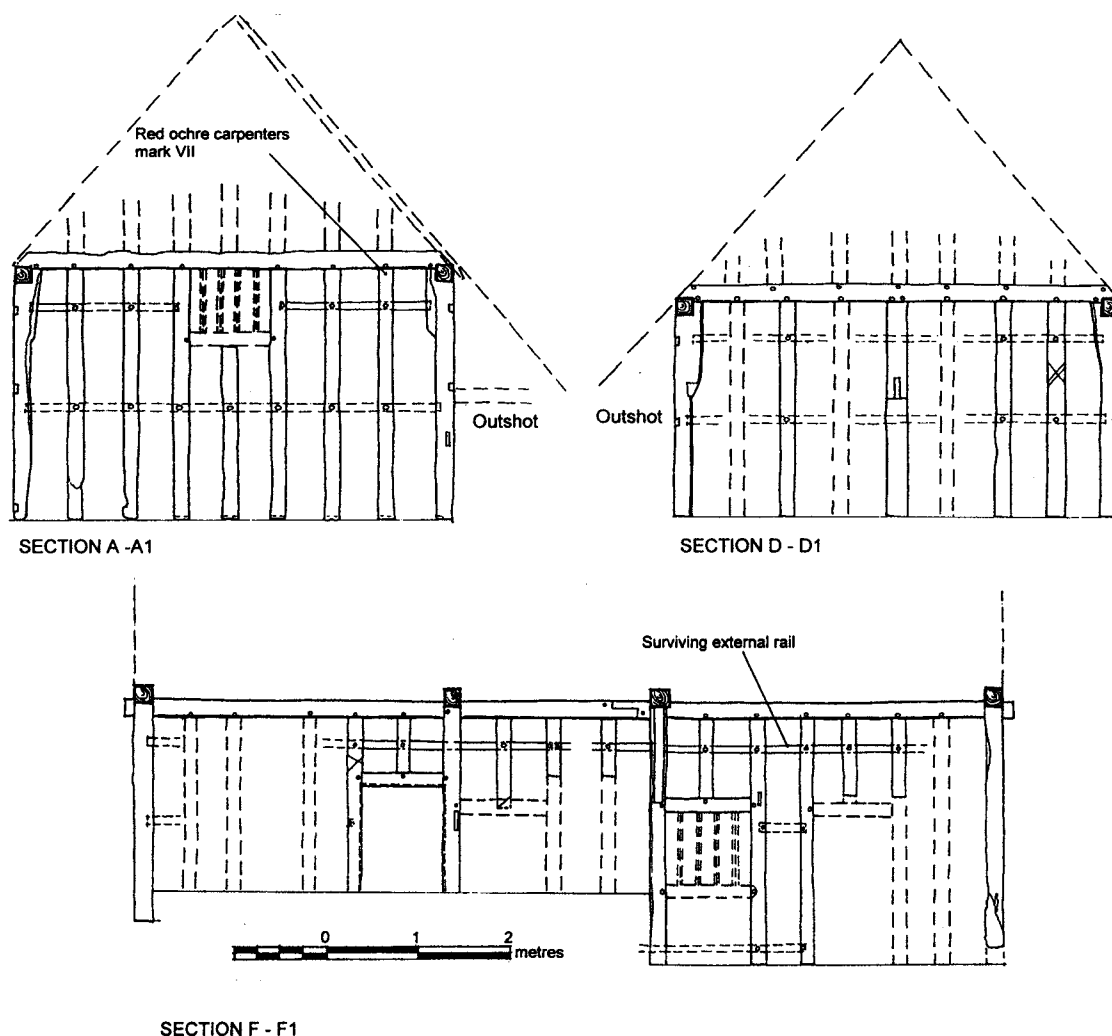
The outbuilding at Borley Lodge Farm, elevations of the two end trusses and the interior of the west wall.
